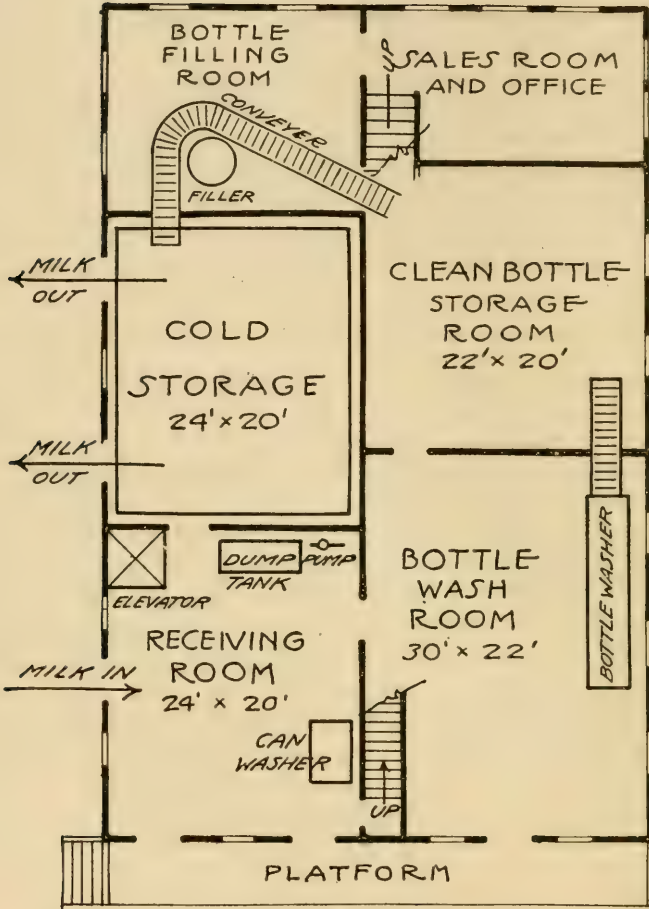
First-floor plan of a two-story plant of from 2,000 to 3,000 gallons' daily capacity.
